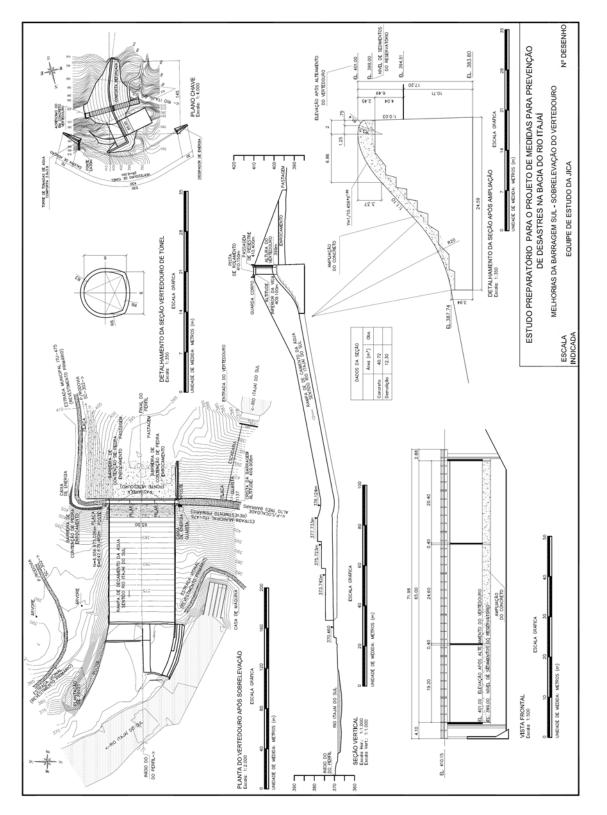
Heigtening of the Sul Dam and Additional Conduit
